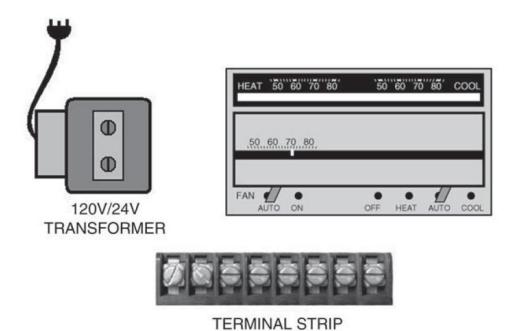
■ Transformer, Thermostat, and Terminal Strip Layout
